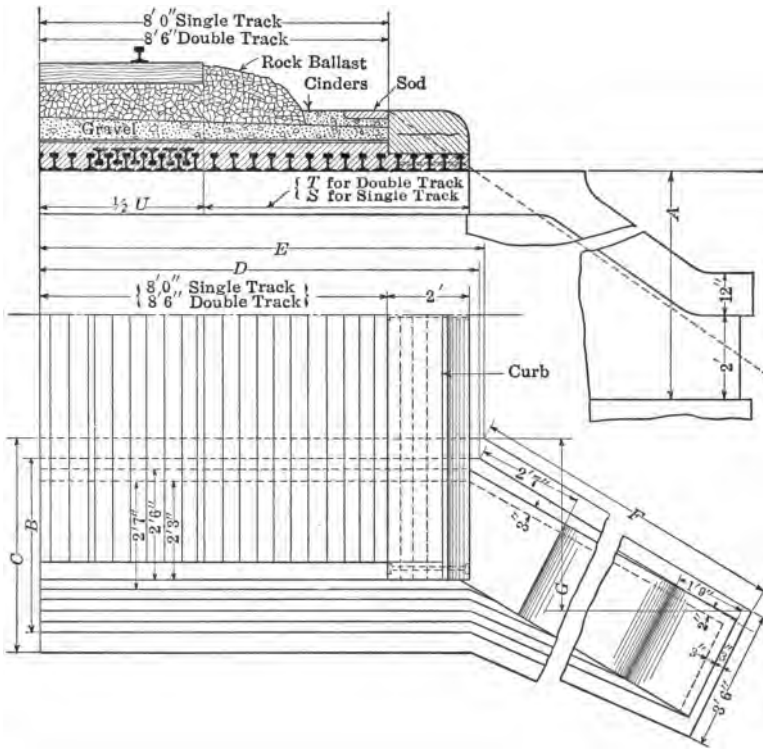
New York Central Railroad Rail Floor Culverts.
